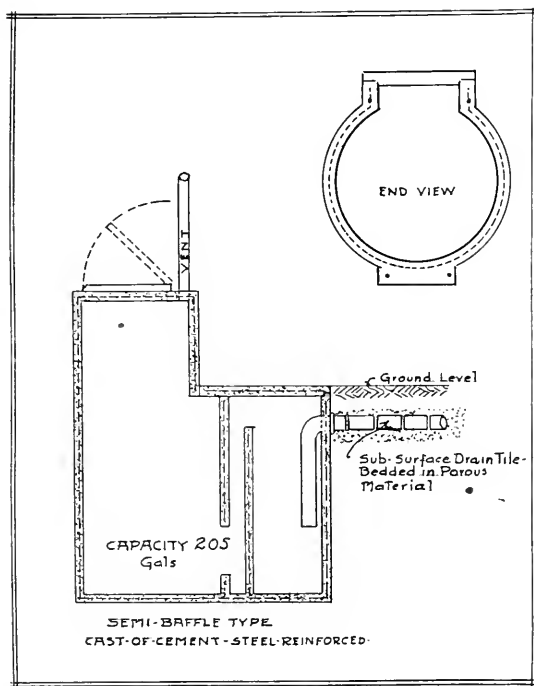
Commercial septic privy, employing baffle and weir in its construction.
